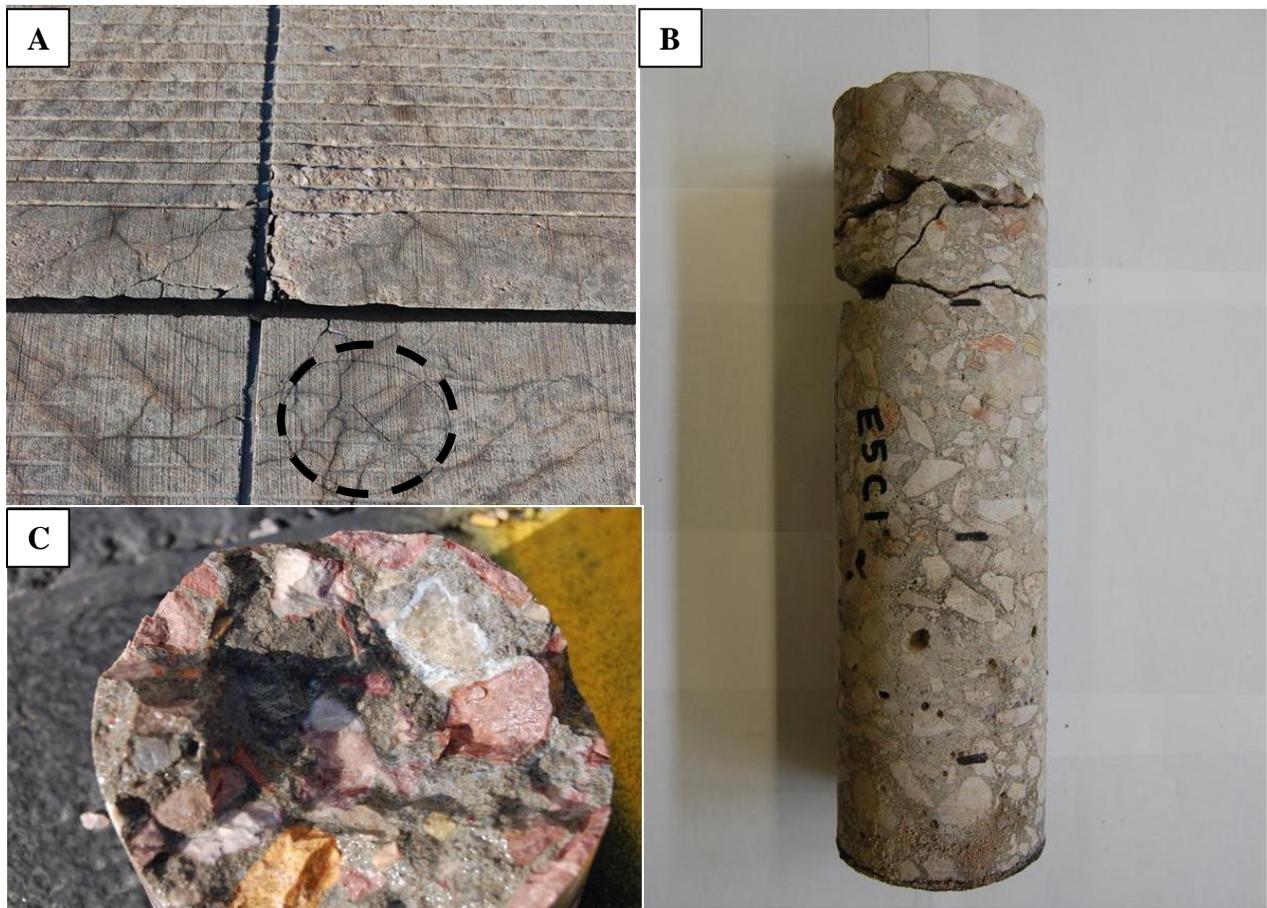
A – (A) Typical location for coring in a distressed pavement (Taxiway Echo Connector 5 at Airport IV) (B) – Physical condition of the core showing cracks running down from the pavement surface (C) Fractured surface showing reaction rims and white reaction product surrounding coarse aggregate particles. The 3.75 in. diameter core is 15.50 inches long with multiple fractures in the core in the top 5 inches.
